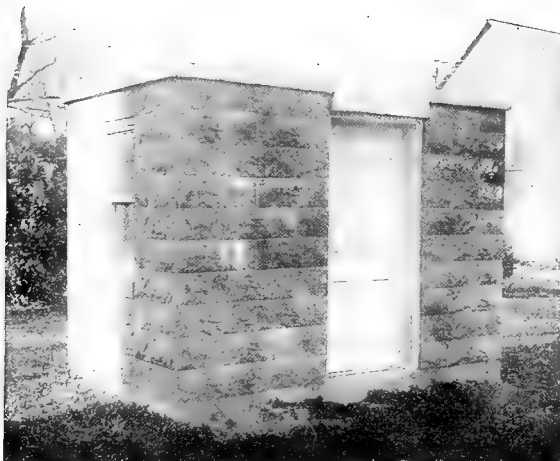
Concrete Block Well House with concrete roof. S. J. Forbes, Owner, Marshall, Minnesota. Built by the Marshall Tile and Sidewalk Company.
